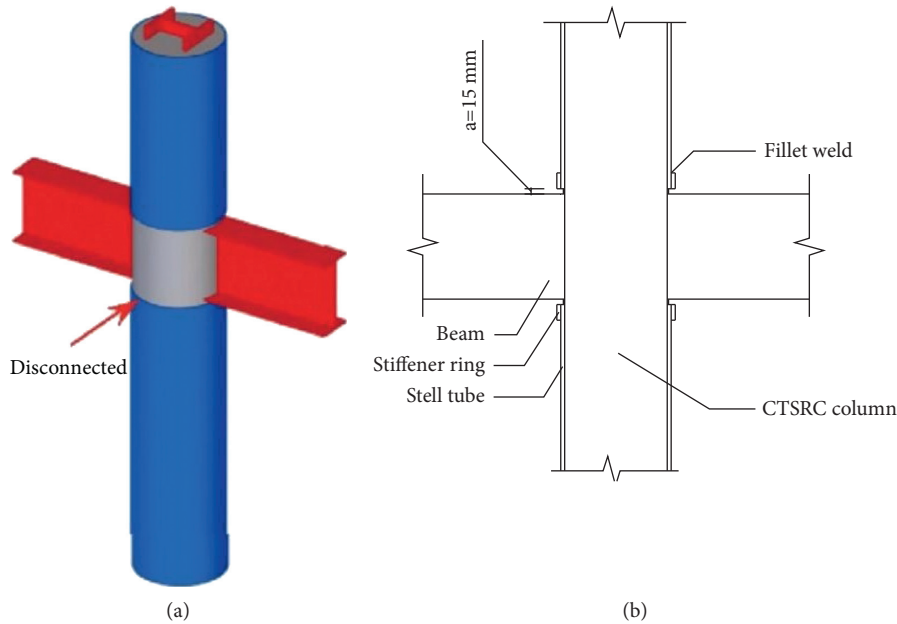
Structural diagram of the circular steel tube-confined H-SRC column steel beam joint. (a) Diagram. (b) Slotted structure of the steel pipe at the column end.
